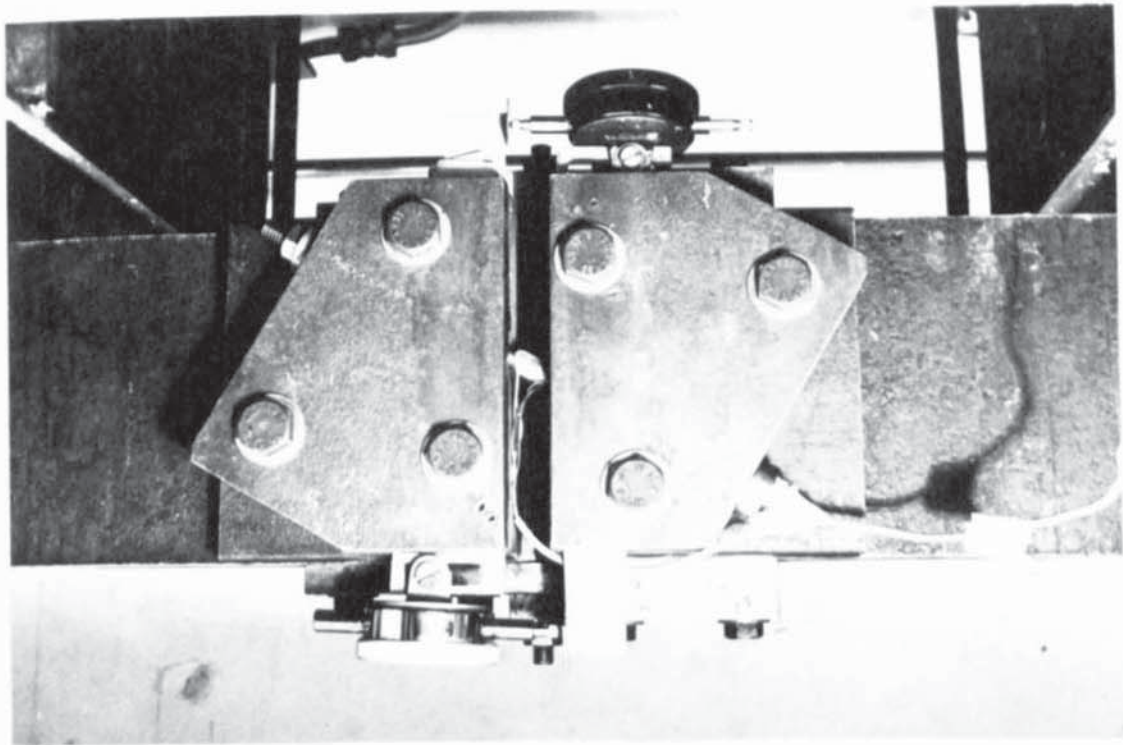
PLAN VIEW, TENSION FACE (STEEL ANALOGUE)
